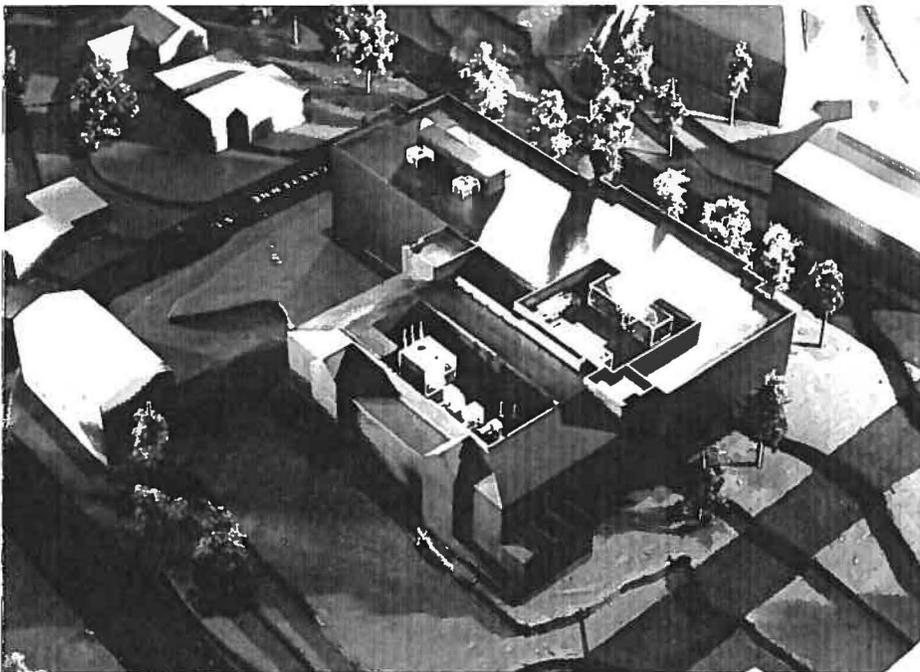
Model Turntable and Coolbaugh Hall Roof Pictures
